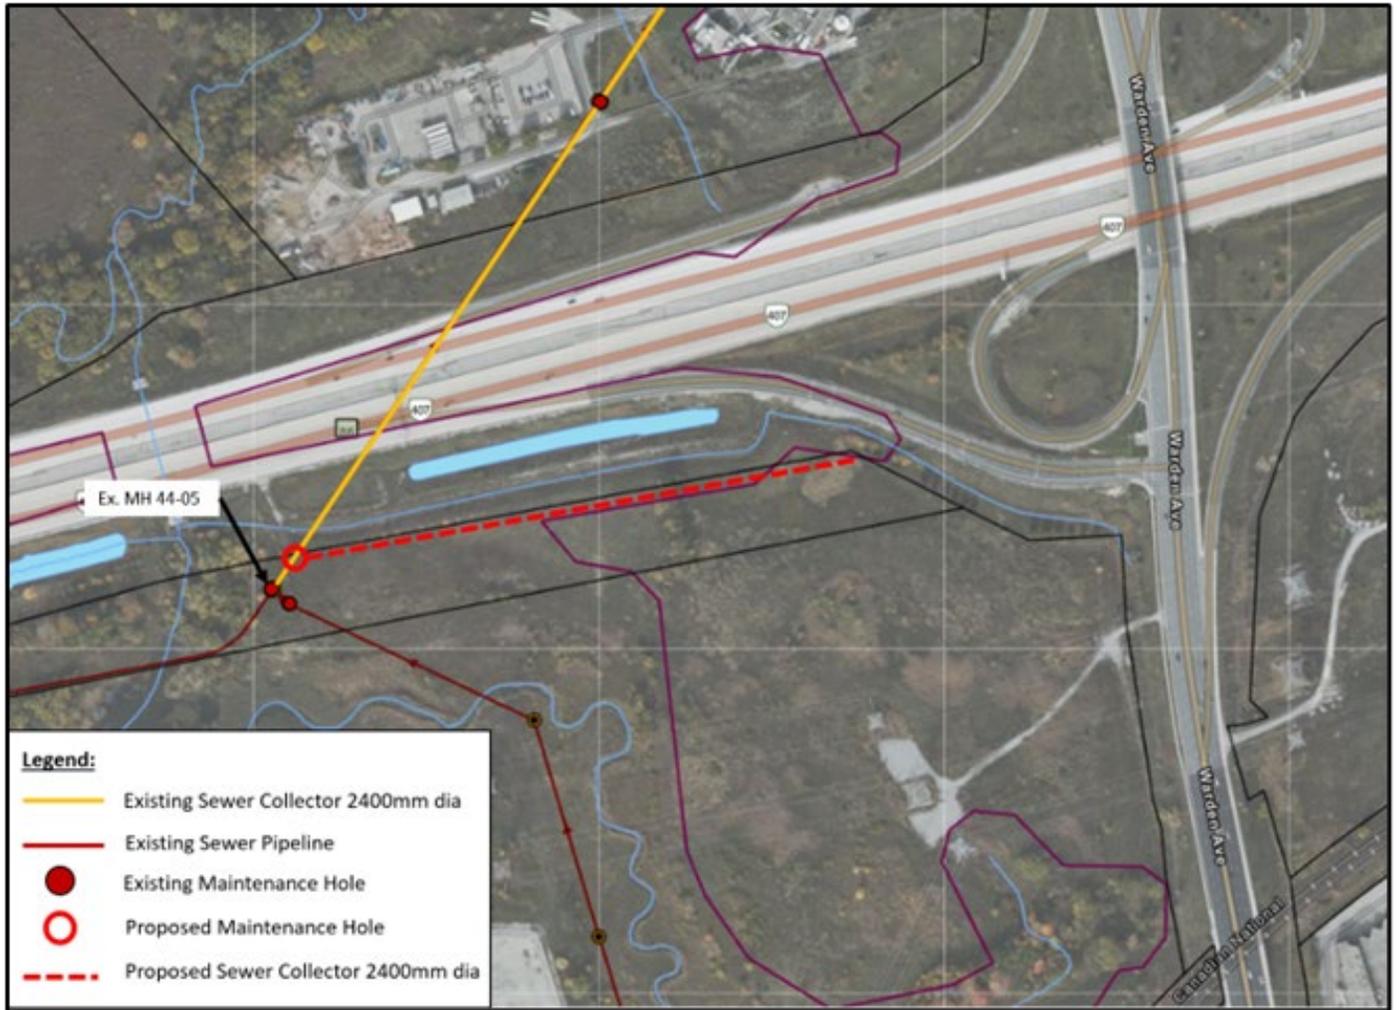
Proposed Upstream Connection Near Existing MH44-05
